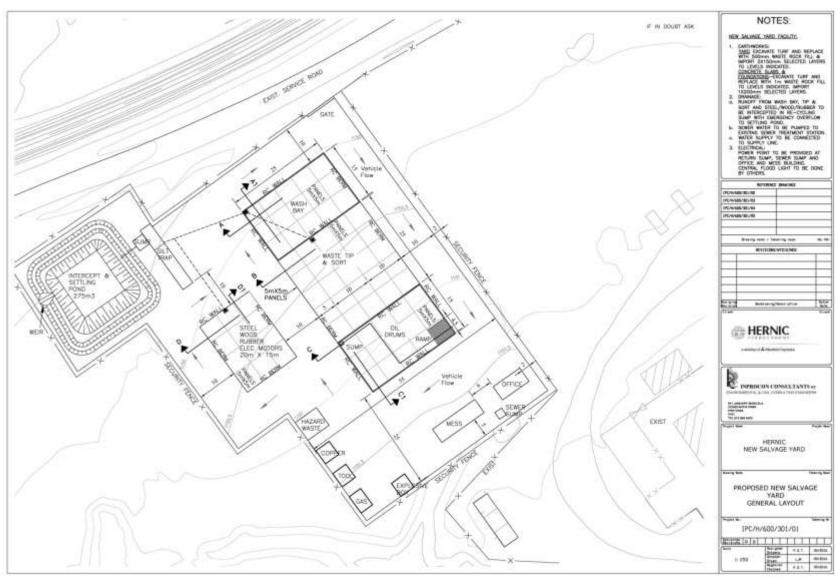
(c): Conceptual Design Layout of the New Proposed Salvage Yard
